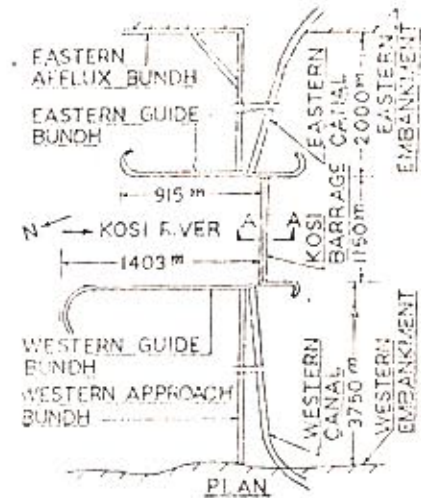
B SHOWING PLAN OF KOSI RIVER BARRAGE
